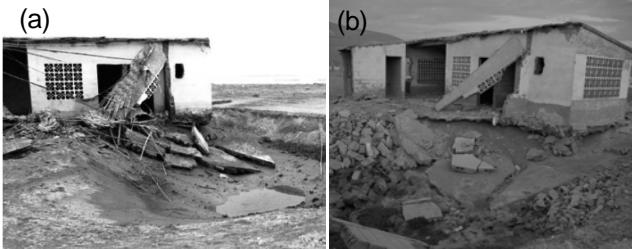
Damaged house and destruction of the foundation in (a) 2001 (Dengler, 2001) and (b) 2010
